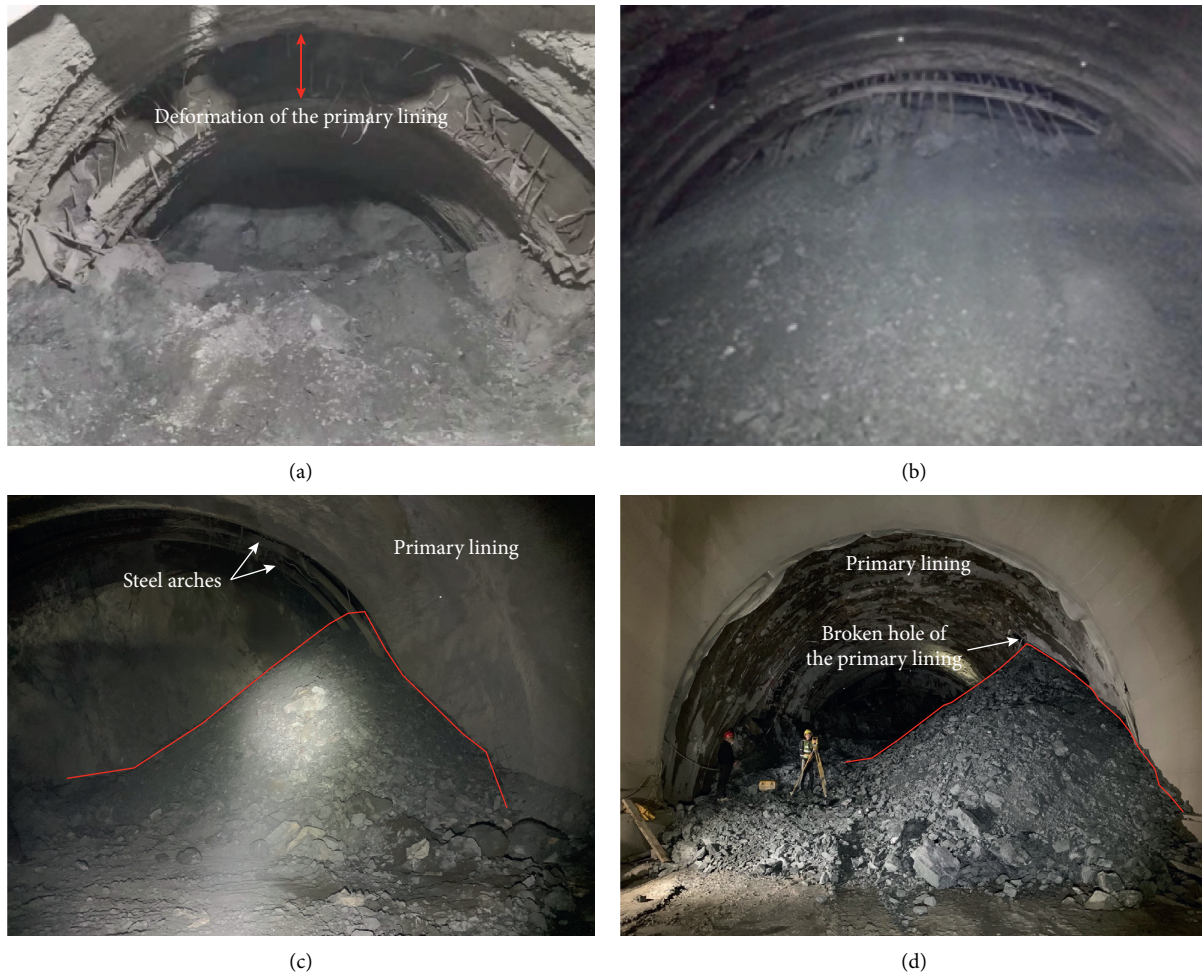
Engineering problems in Tayi tunnel: (a) large deformation of the primary lining due to soft surrounding rock mass; (b) collapse of the tunnel excavation face; (c) collapse of the tunnel side wall after installing steel arches but before spraying shotcrete of the primary lining; (d) broken primary lining after spraying shotcrete.
